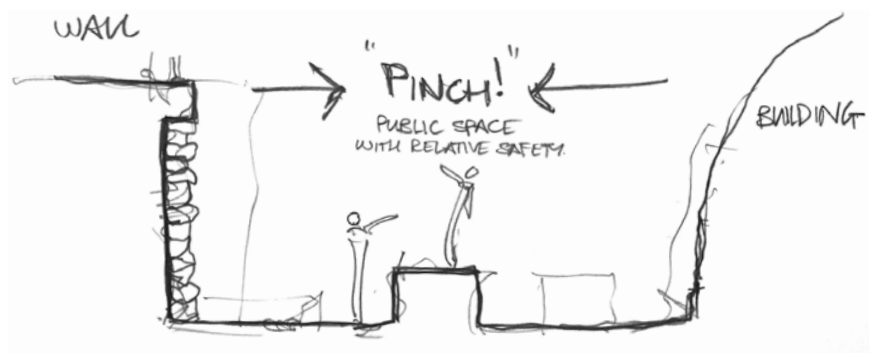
(above) early sketch of the void between the Old Wall and the new building.
